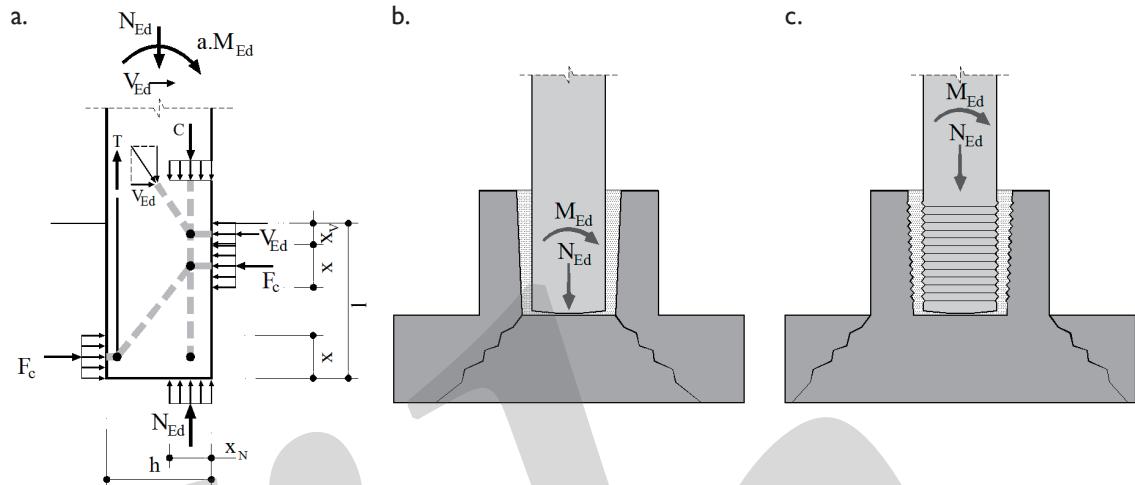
Design of socket foundation (Ebeling et al., 2008)
